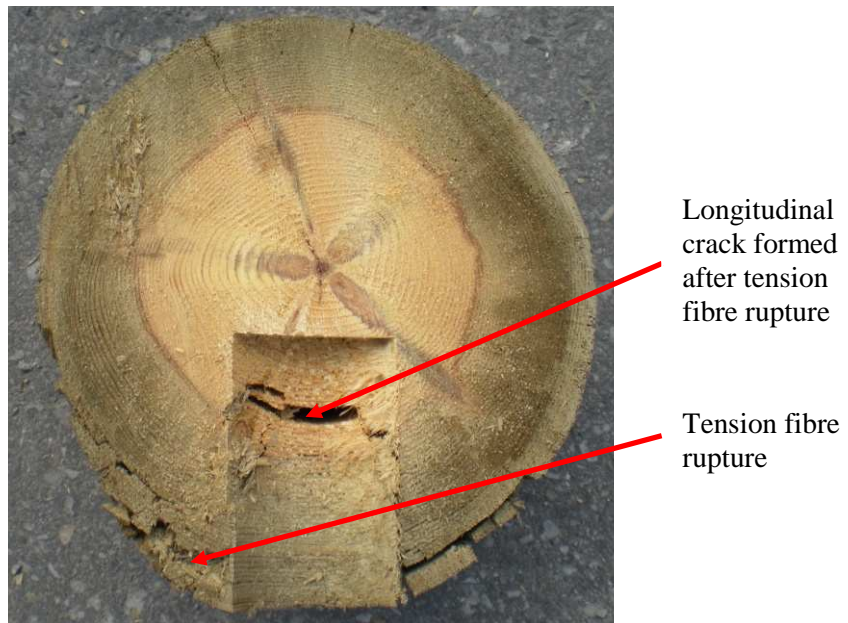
Cross-section of new pole specimen with tension feeding damage (60-2-1).
